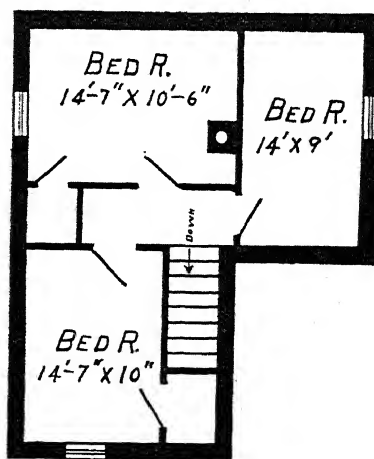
FLOOR PLANS OF HOUSE SHOWN IN FIG. 4.
